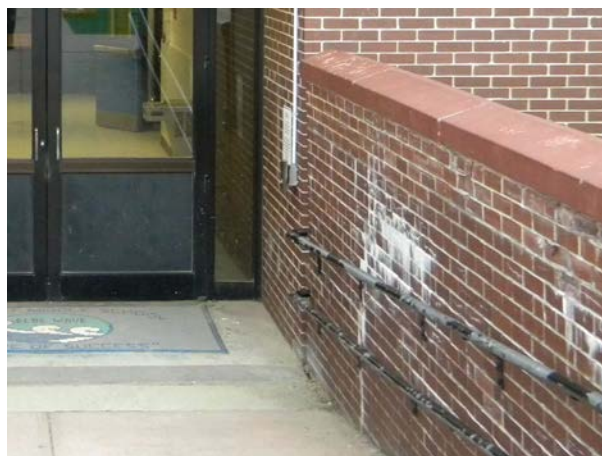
Efflorescence at exterior brick walls at entrance ramp.
